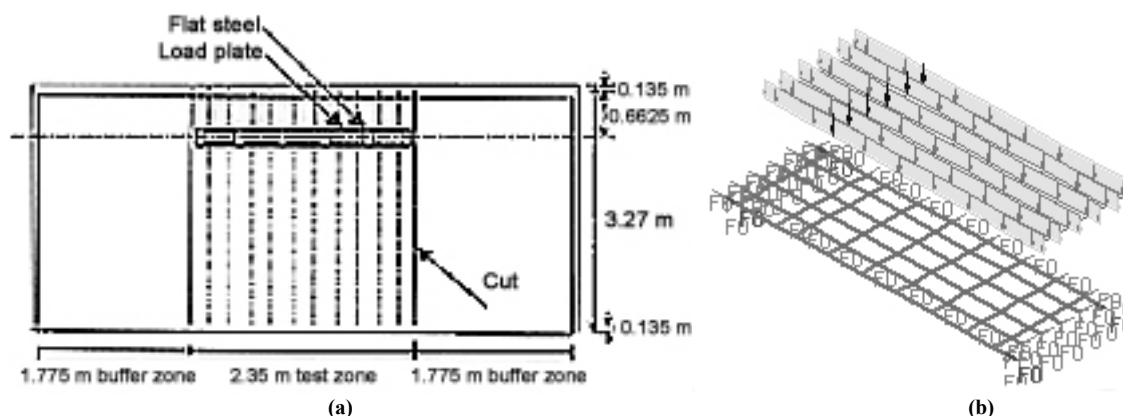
(a) original test layout² (b) SAFIR grillage model and loads for BEF 2005 tests
